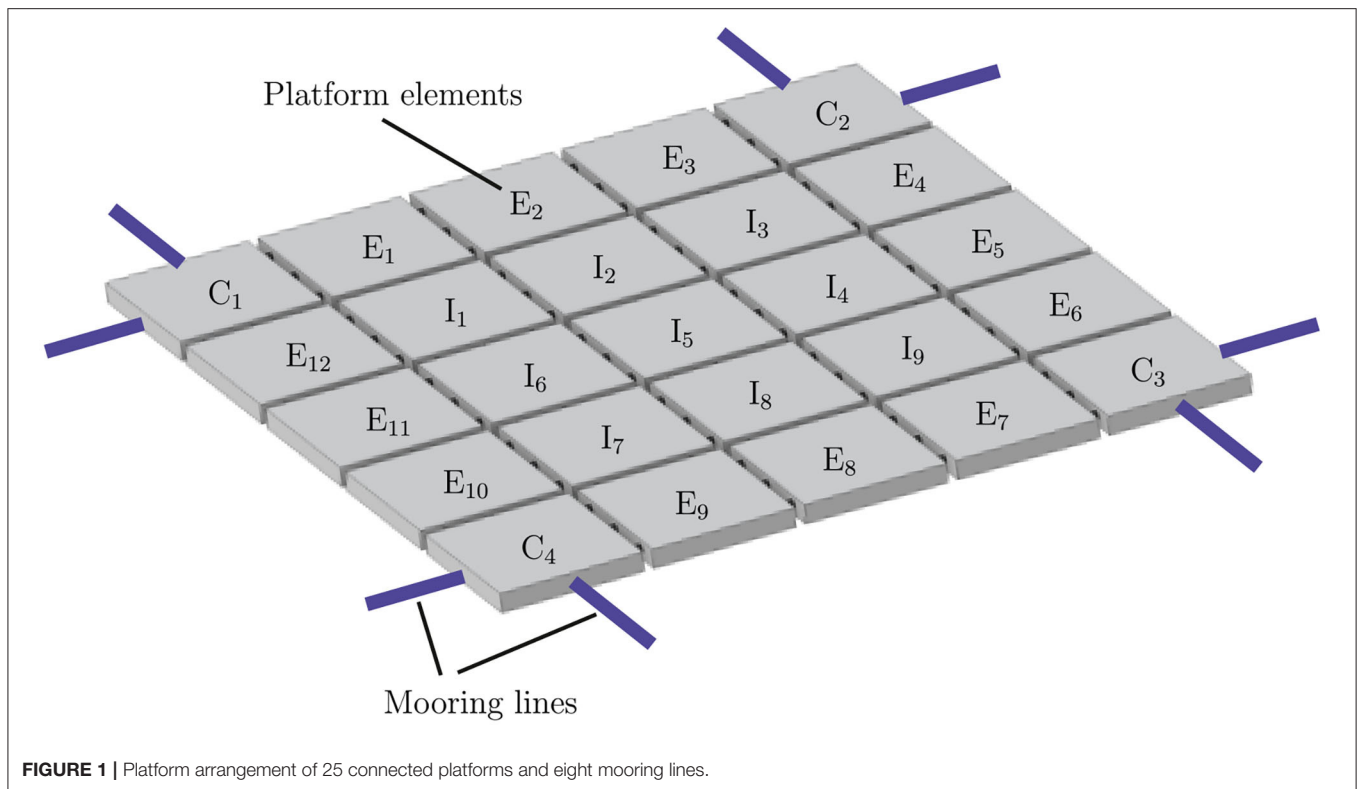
| Platform arrangement of 25 connected platforms and eight mooring lines.
